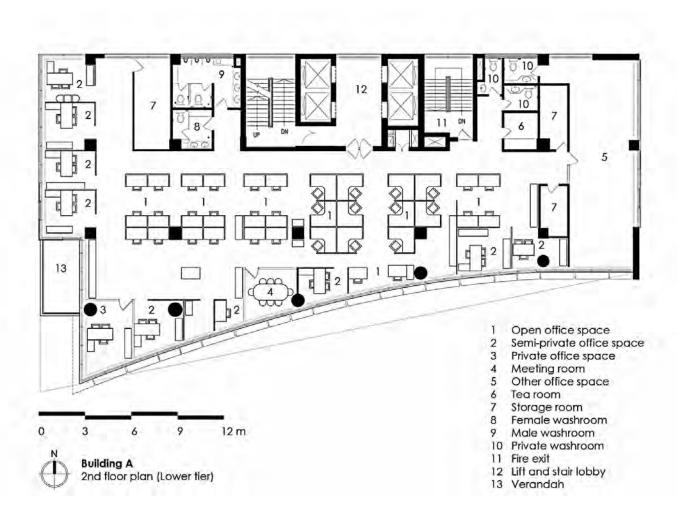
Floor plan of Building A: Lower tier (Source: Building A contractor, edited by author)
